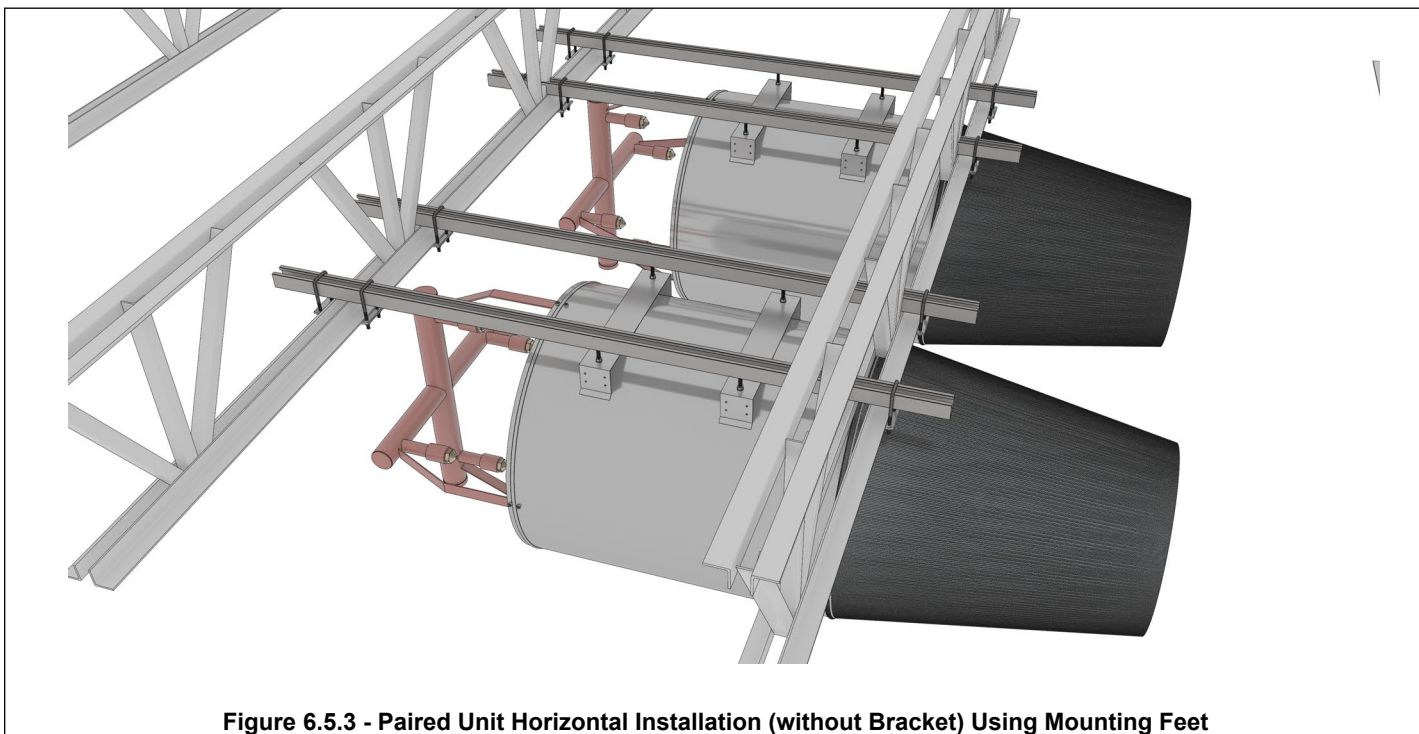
Paired Unit Horizontal Installation (without Bracket) Using Mounting Feet
